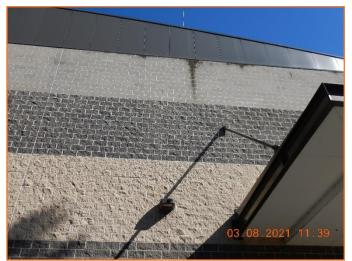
Reasonable - General condition of external masonry wall. Minor water seepage observed.
